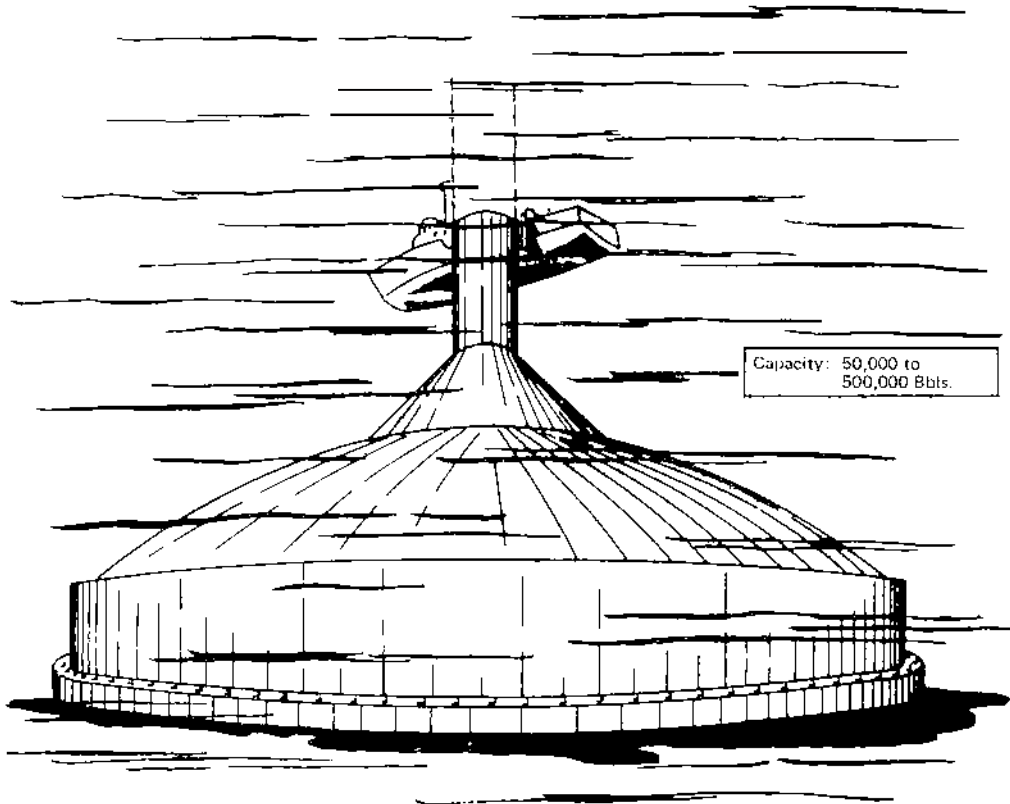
Submerged Storage—Bottom Supported (Sea-Floor Storage).
